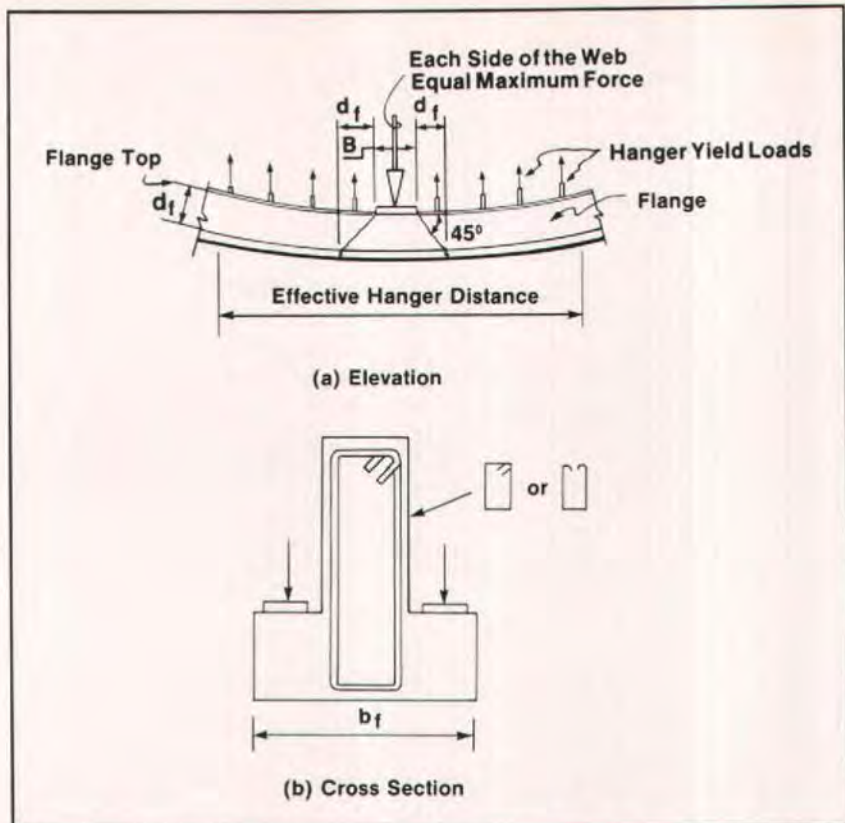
Hanger forces in response to flange loads shown on the beam elevation and details of hanger reinforcement shown in the beam cross section.
